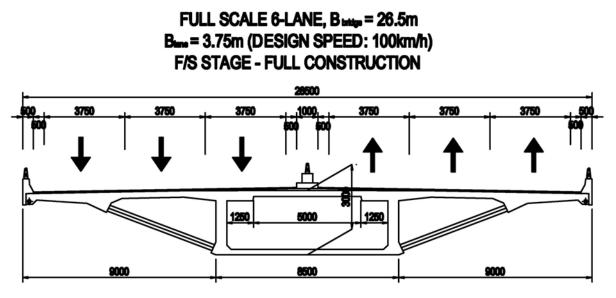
Typical Cross Sections of Alternative (4), Case 6-3.75
